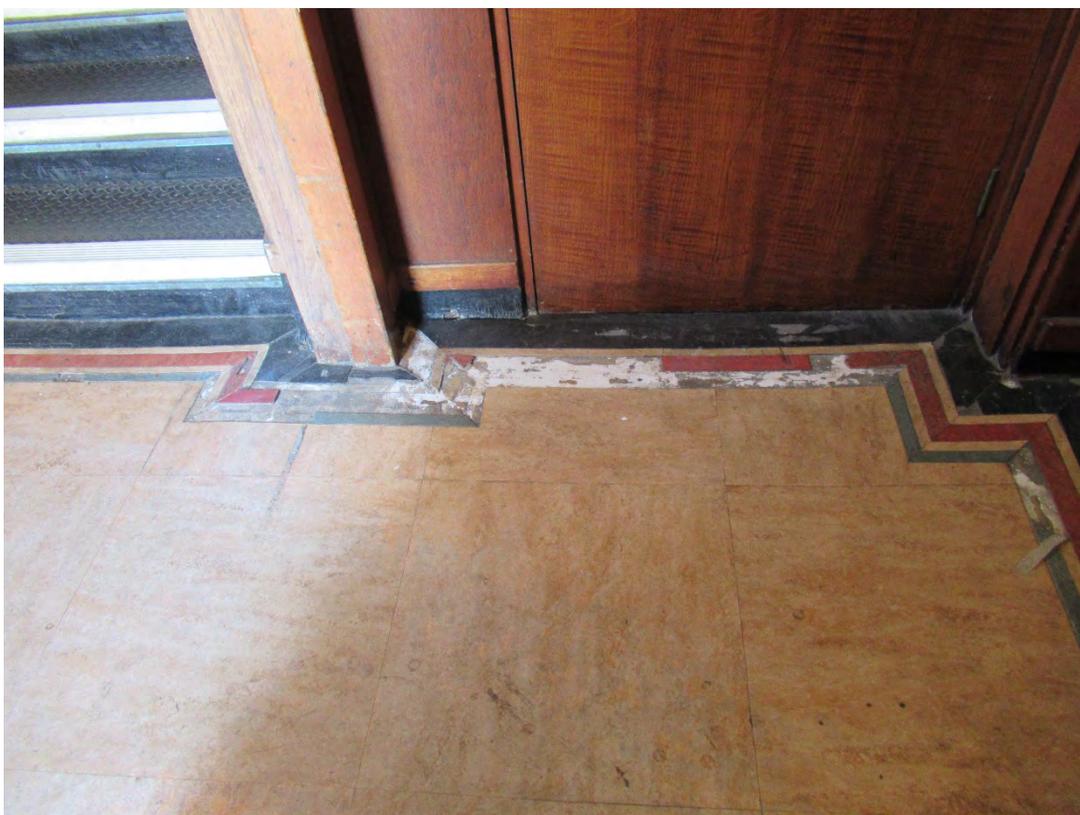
Pieces of flooring are falling coming loose, yet no repairs are made.
